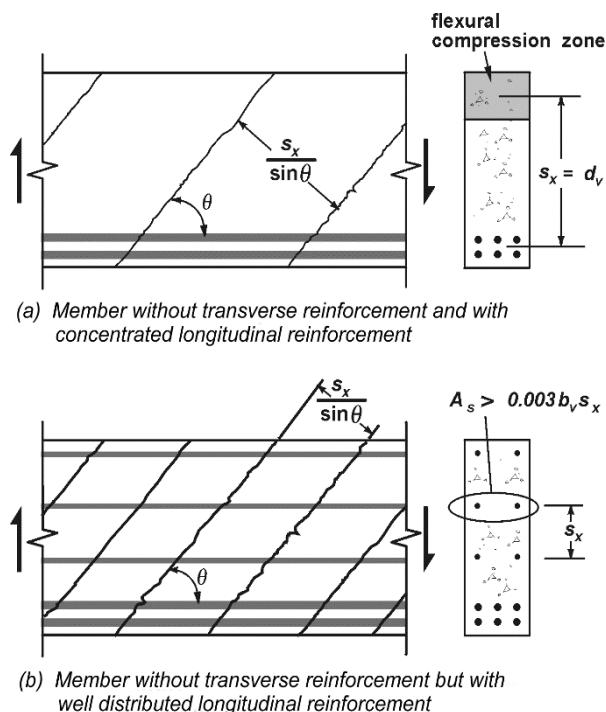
Definition of Crack Spacing Parameter, s_x
